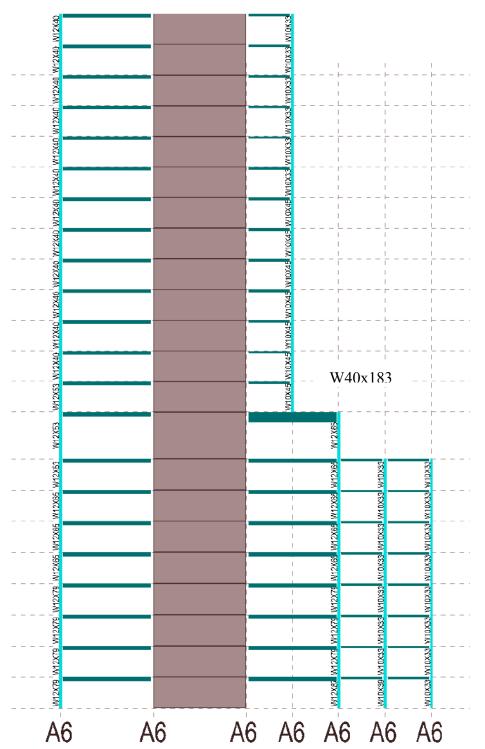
North-South Section through Grid A6 showing Shear Wall, Typical Column Sizes and the Transfer Girder at the 9th Story Level
